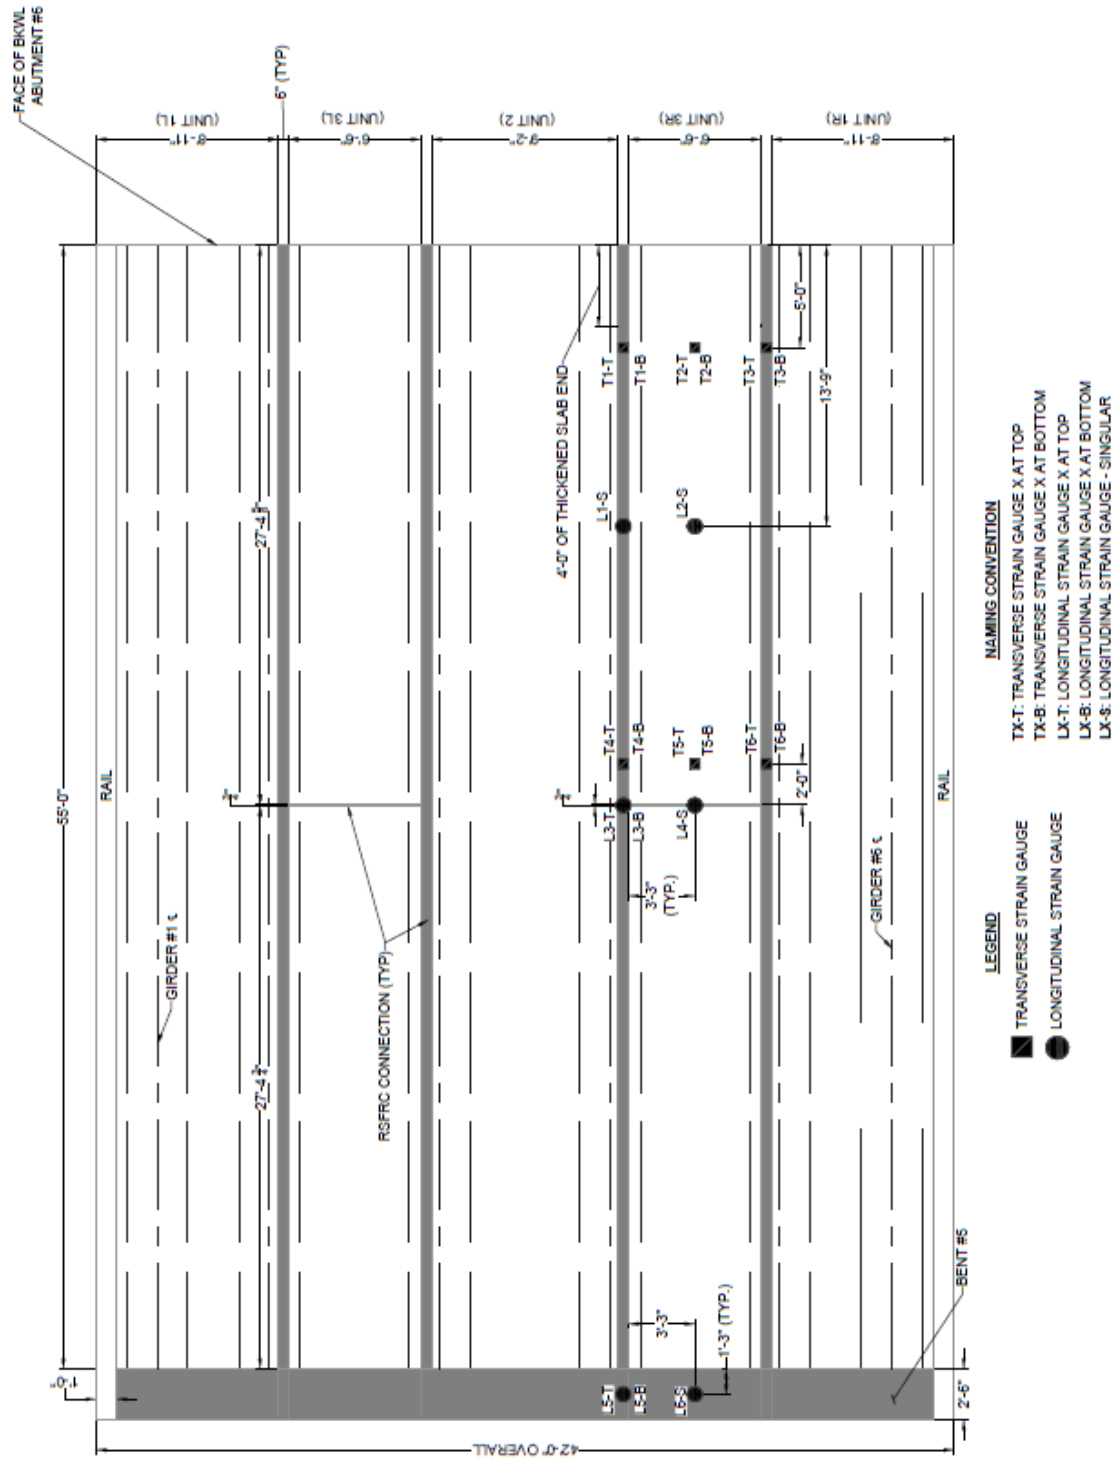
Navasota River Bridge Span 5 Instrumentation Plan
